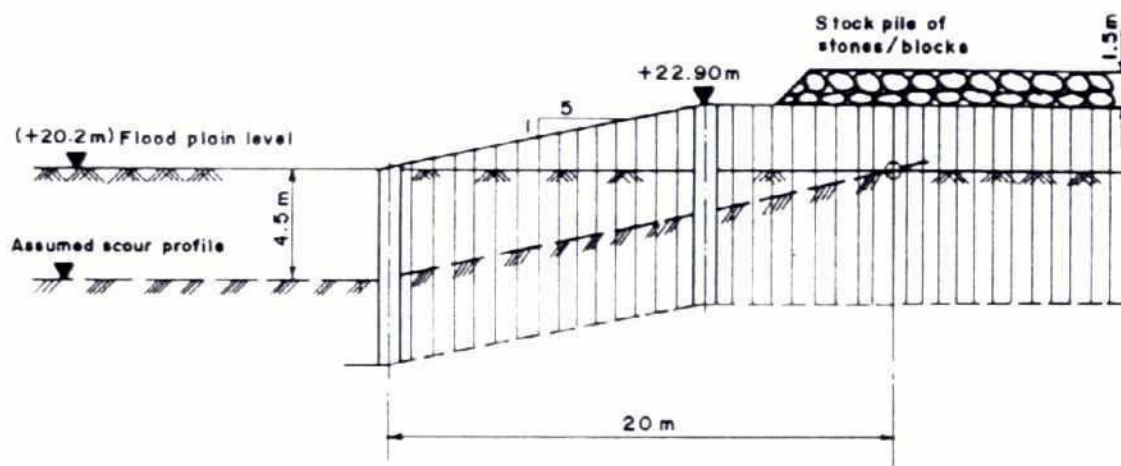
Design Profile Cofferdam as impermeable groyne section
